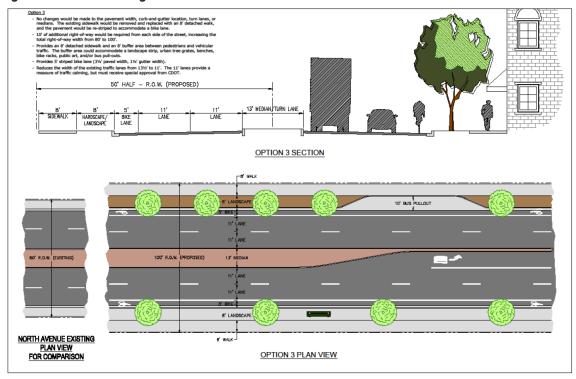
Standard design identified in the 2011 North Avenue Corridor Plan.
